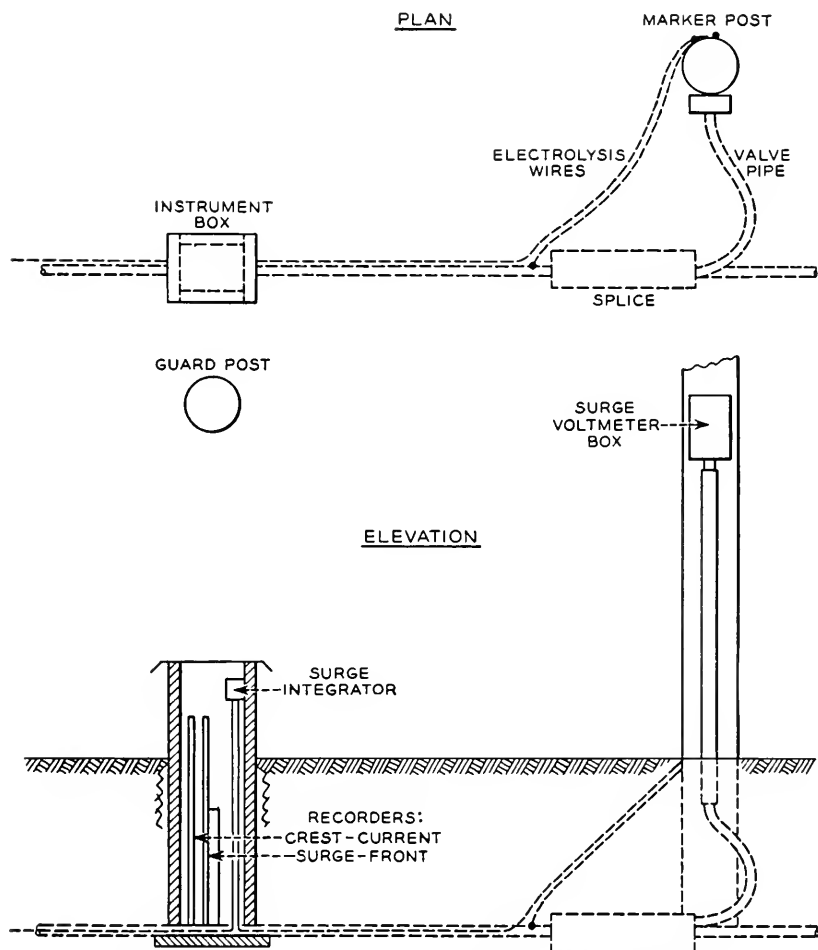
Typical instrument arrangement at splice points about 2300 feet apart.
